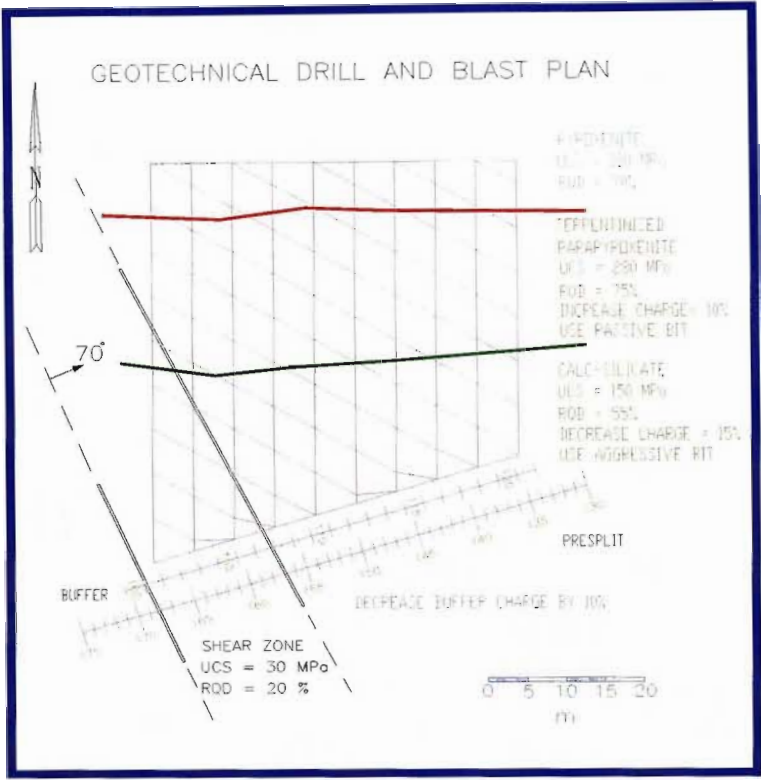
An example of a drill and blast plan illustrating the geotechnical information provided manually for the drill and blast department between 1998 and 2001.
